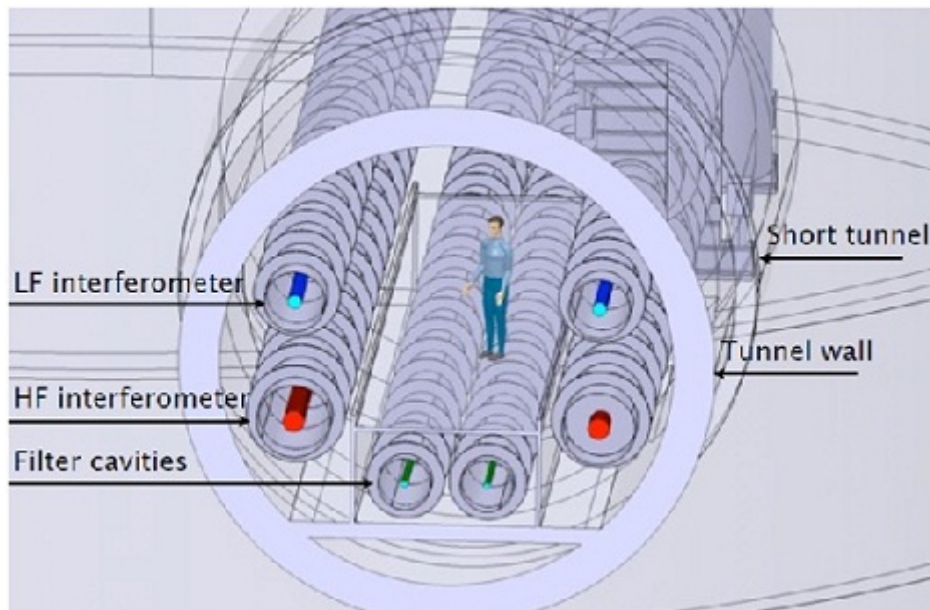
Arrangement of the vacuum pipes in the tunnel cross-section.
